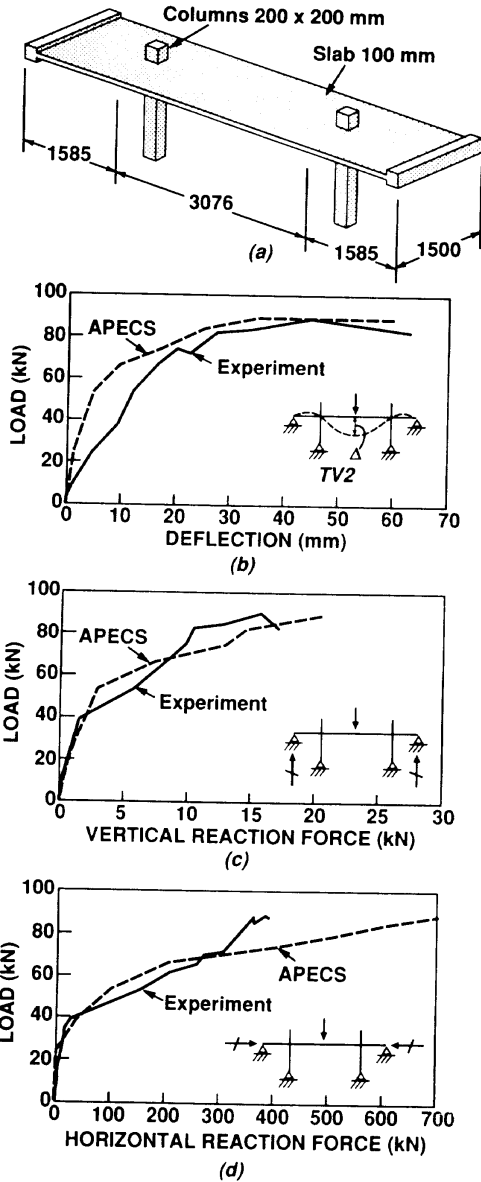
Slab Strip Test Specimen TV2: (a) Specimen Details; (b) Center Span Load-Deflection Response; (c) Vertical Force Reaction at Slab Ends; (d) Horizontal Force Reaction at Slab Ends
